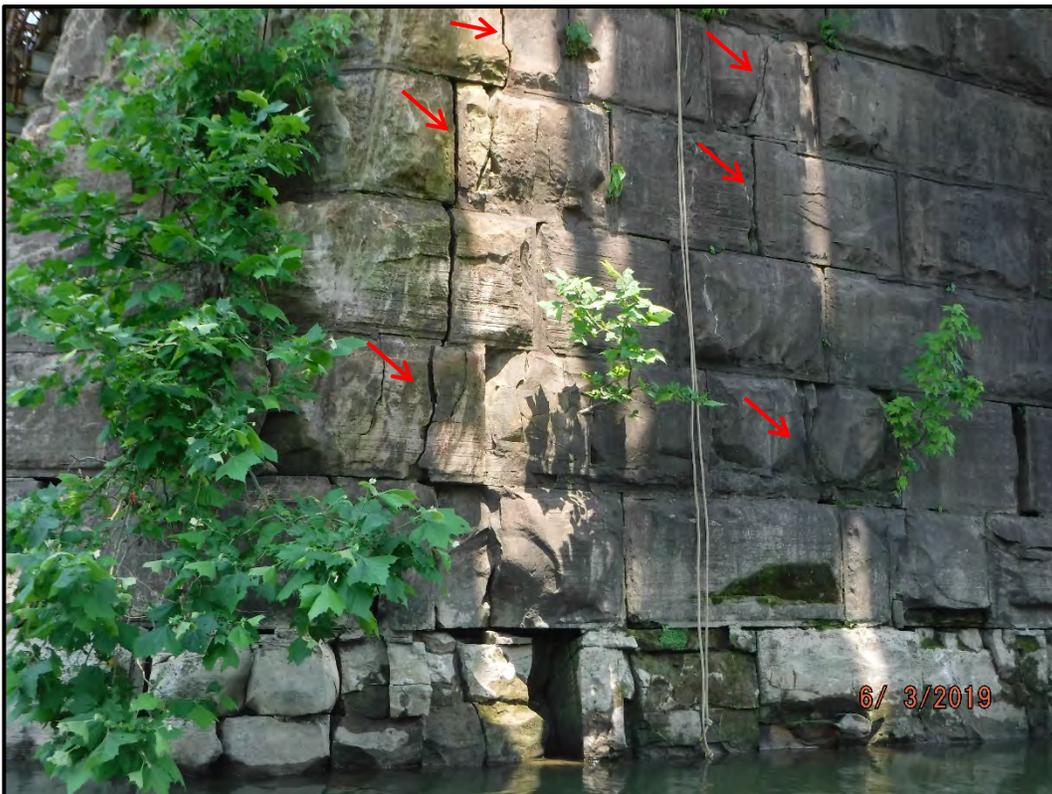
Vertical crack on the east face of Pier 5 that extends from the pier cap, at the south edge of the truss beam seat, to the waterline with the crack width increasing to 7/8in wide at the waterline. Note the typical heavy cracking of the stone at the waterline.
